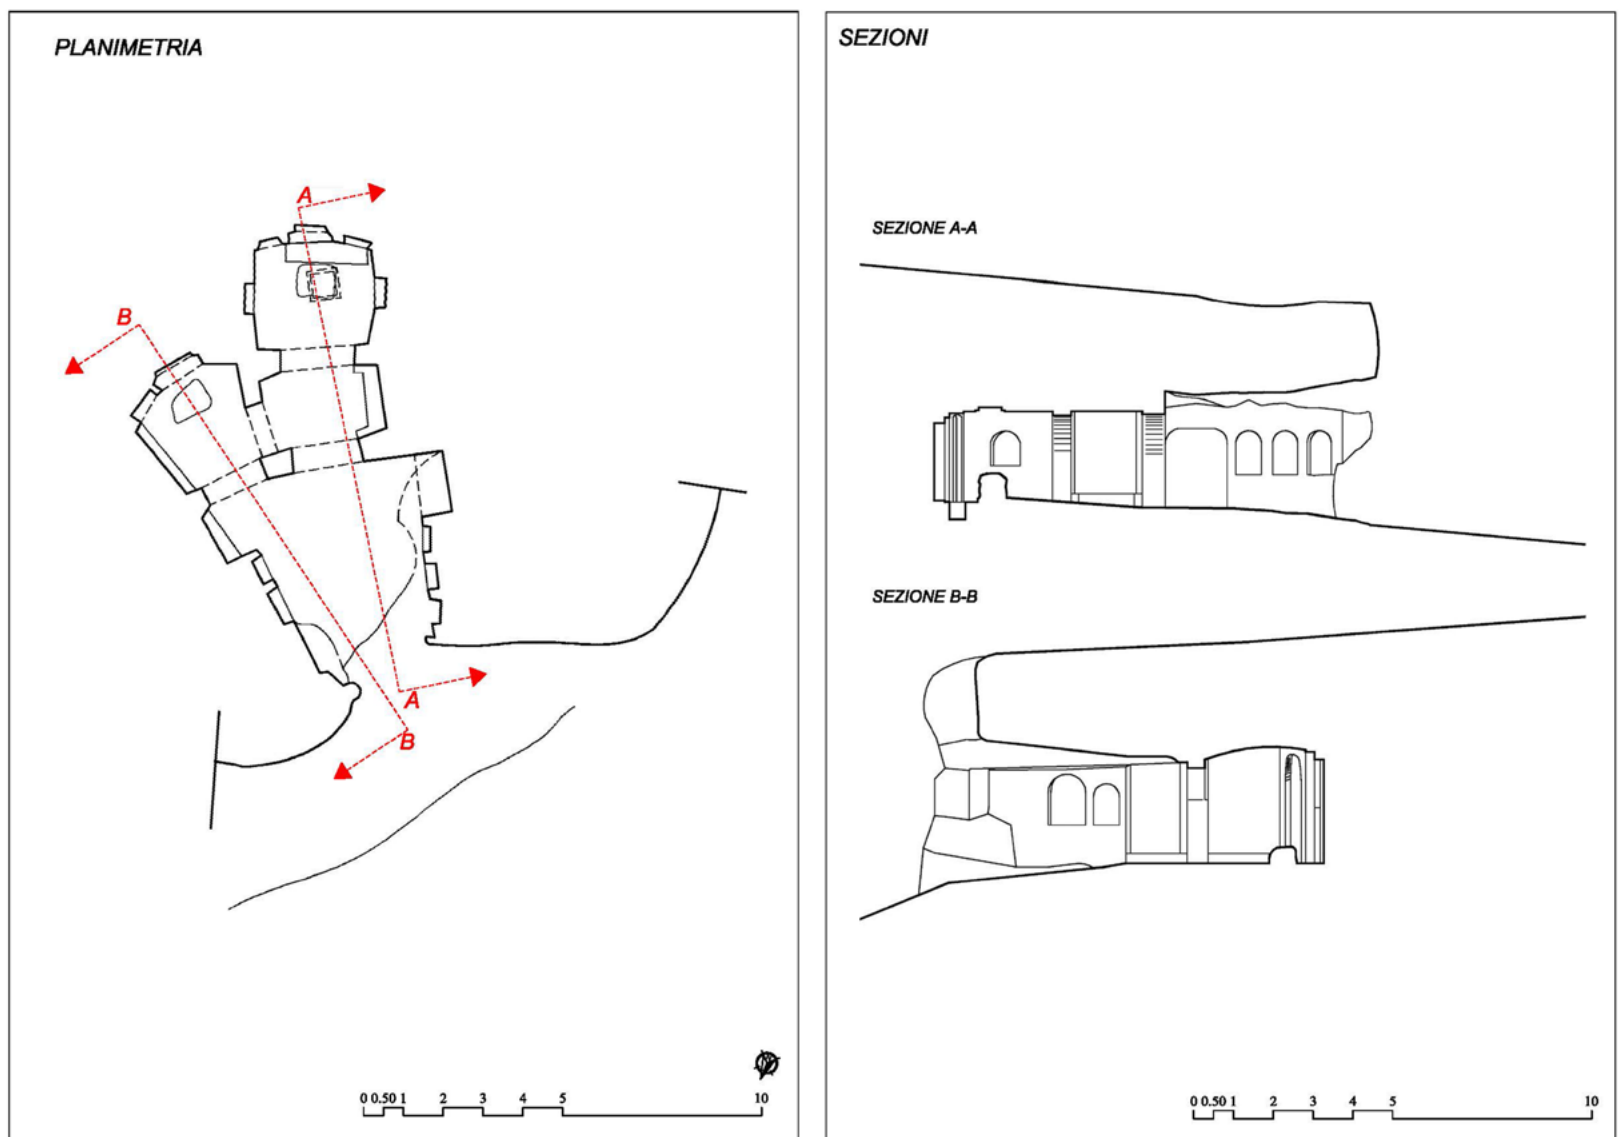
Matera, San Biagio Vecchio/San Vito alla Murgia, plan and sections (provided by Maurizio Lazzari)
